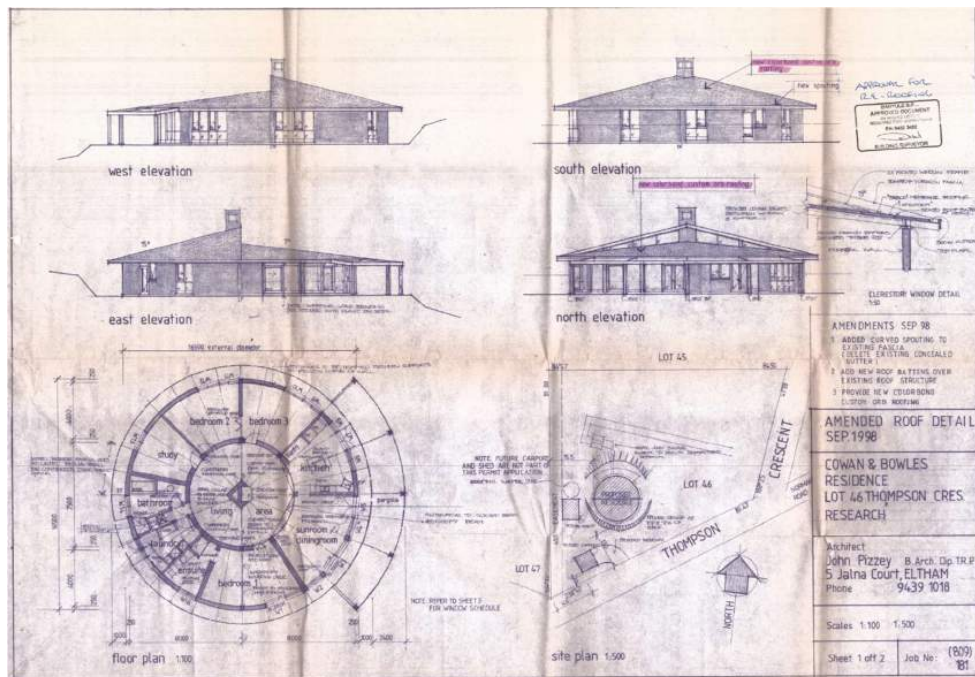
Plans by architect John Pizzey for Cowan and Bowles residence at 57 Thompson Crescent, Research, 1998. (Source: BP)
